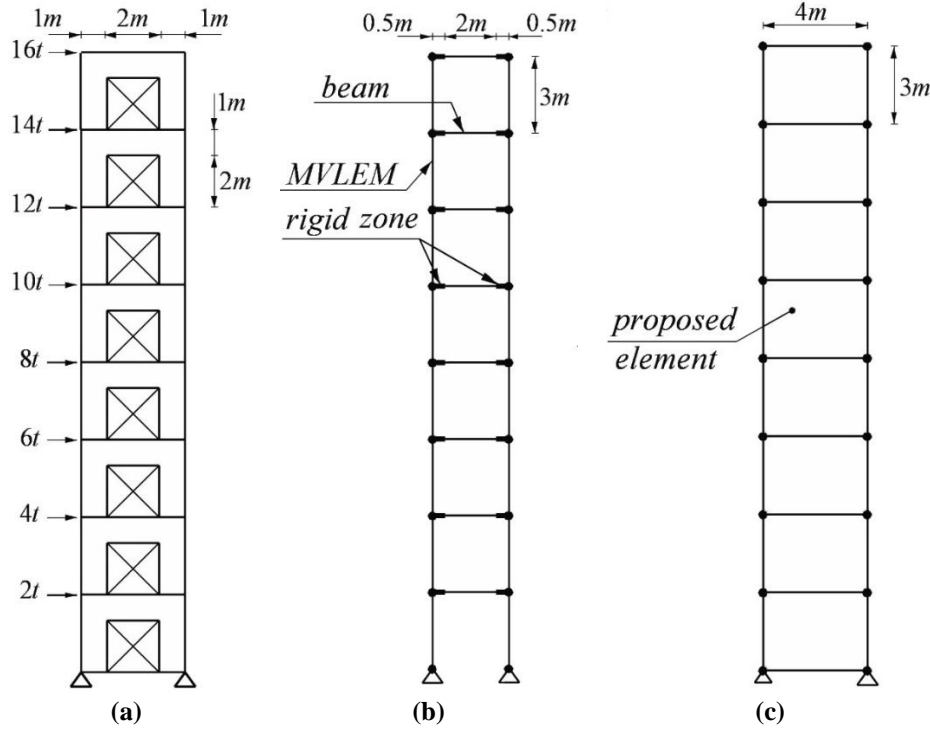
a) Example shear wall with door type opening; b) modeling of shear wall by using MVLEM elements and; c) modeling of shear wall by using proposed element
